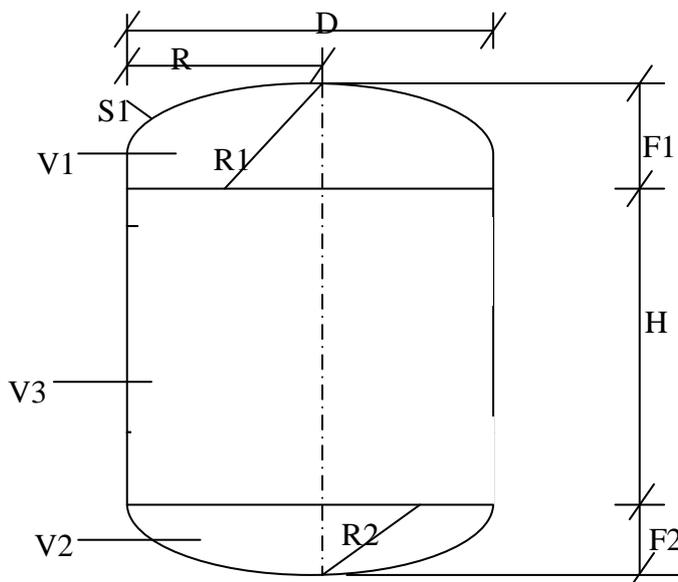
Geometrical dimension of the cylindrical shaped biogas digesters
